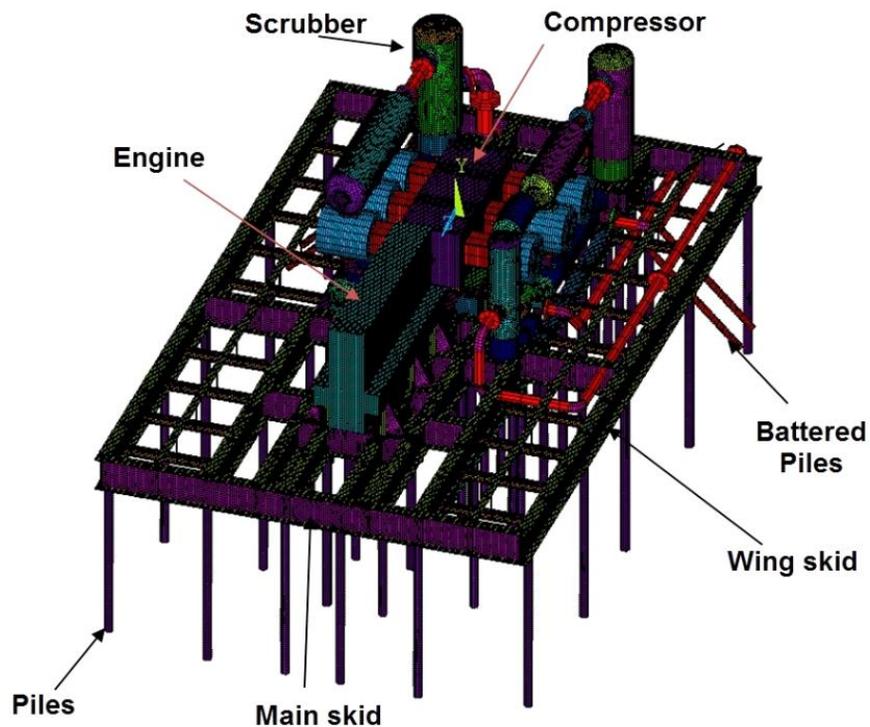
Equipment mounted on a fabricated steel skid mounted directly on driven screw pilings.
